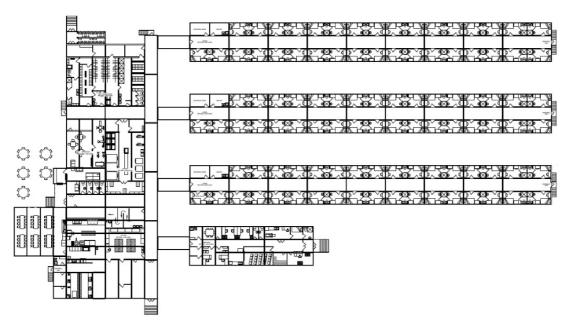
Proposed View of Camp Facilities and of Camp Complex
